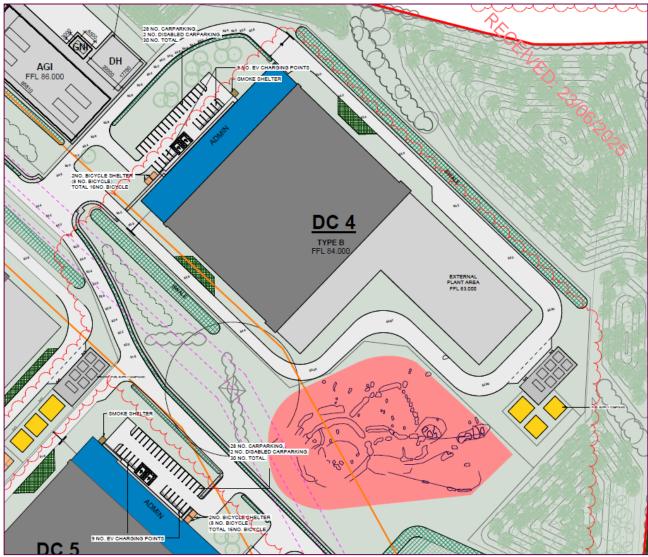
Amended Proposed Site Plan (extract of now submitted drawing 22217-RKD-ZZ-ZZ-DR-A-1012-PROPOSED SITE PLAN B)
